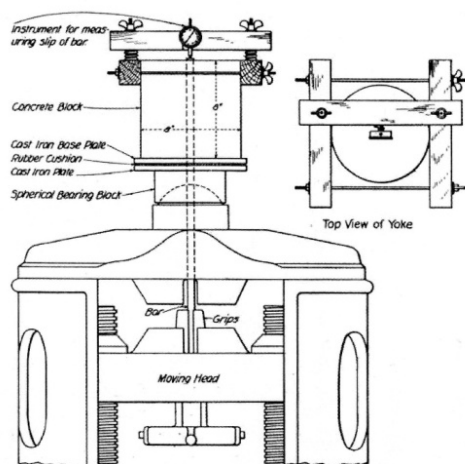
PULL-OUT SPECIMEN IN MACHINE READY FOR TEST.
